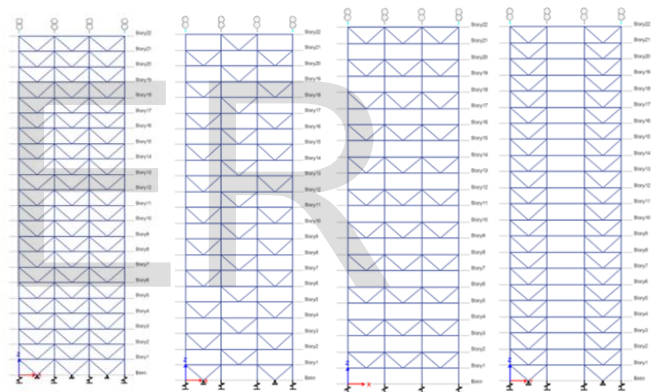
ELEVATION OF 22 STOREY DIAGRID BUILDINGS WITH V BRACING PATTERN ARRANGEMENT ((A) WHOLE, (B) ALTERNATE, (C) HORIZONTAL, (D) VERTICAL)
